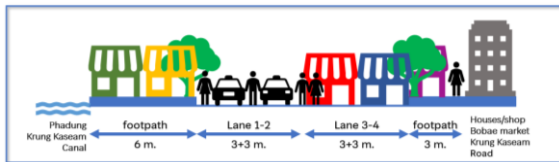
The current market layout in 2021 (cross section view) for comparison with the new layout of proposal
